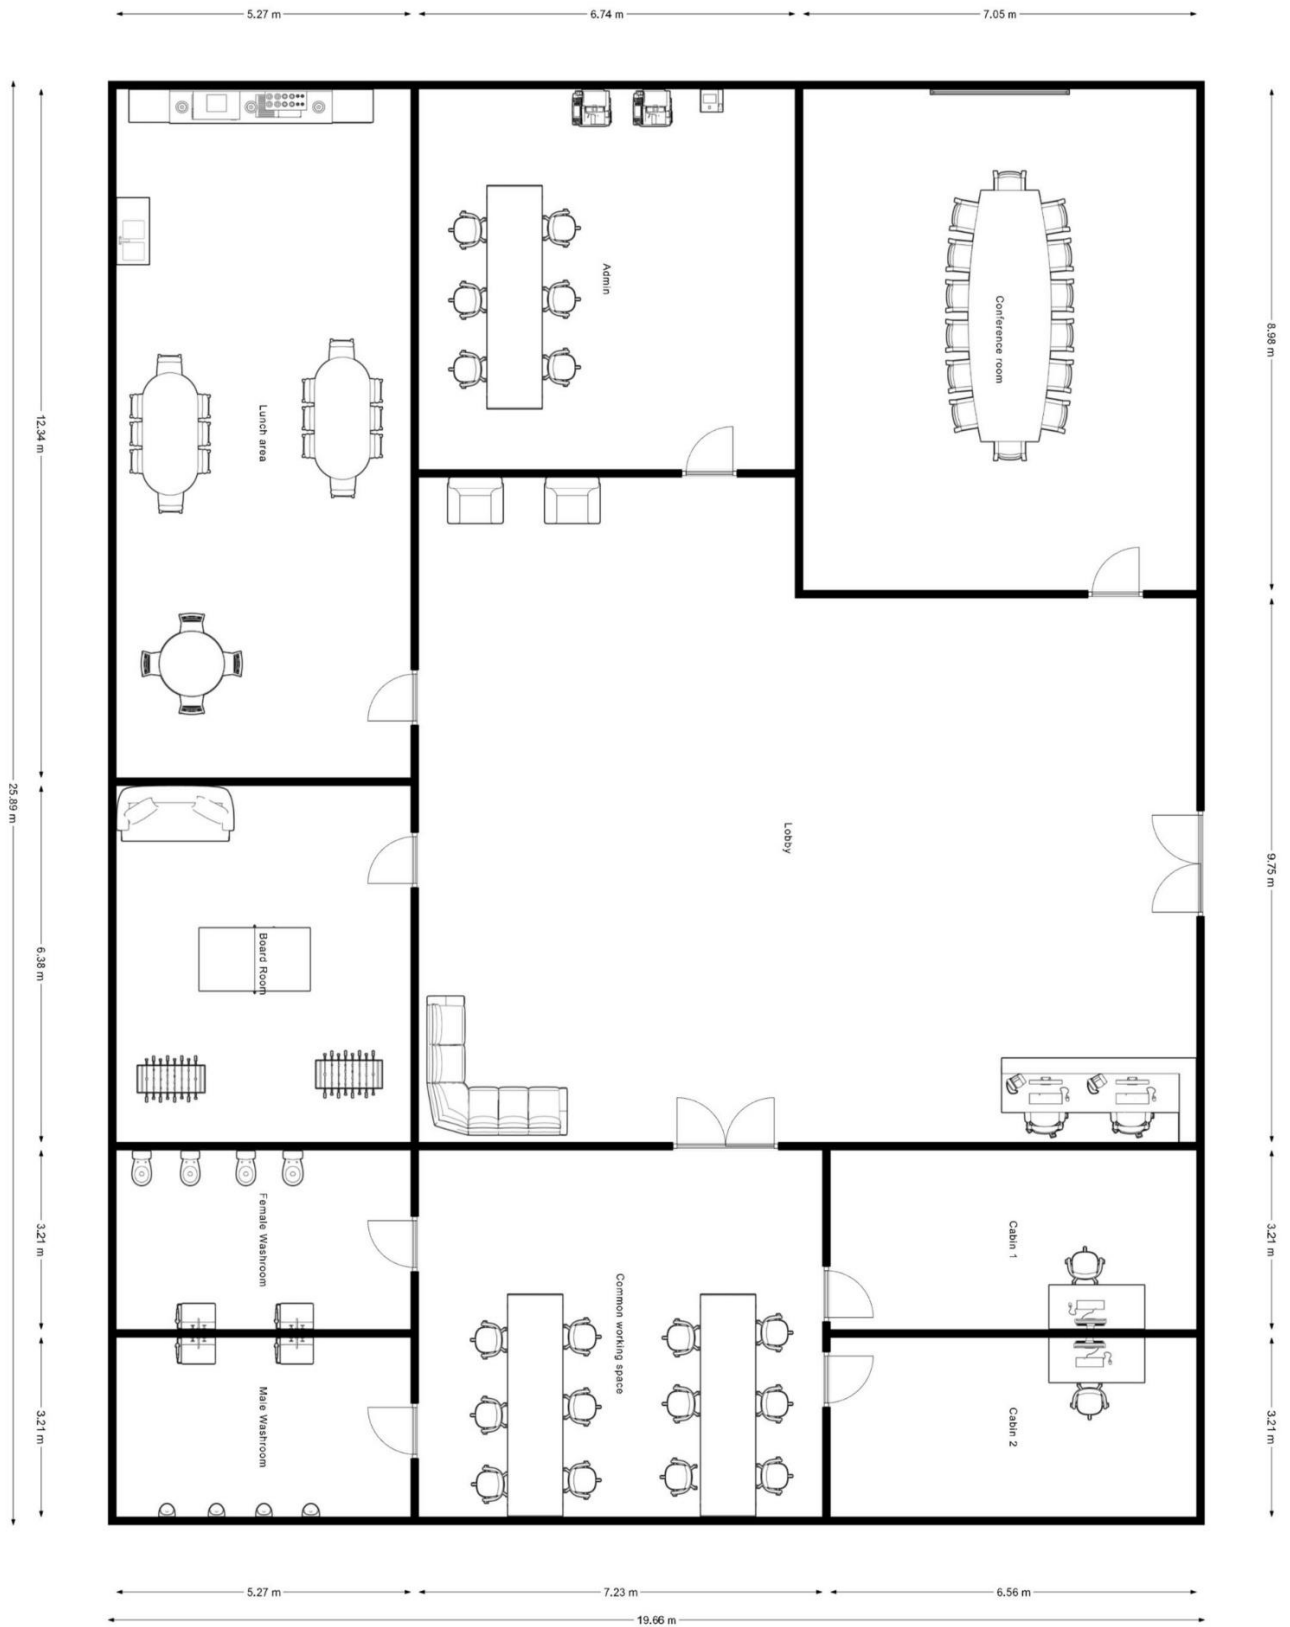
Floor plan layout (all dimensions are in meters) (North side is on right side in this page)
